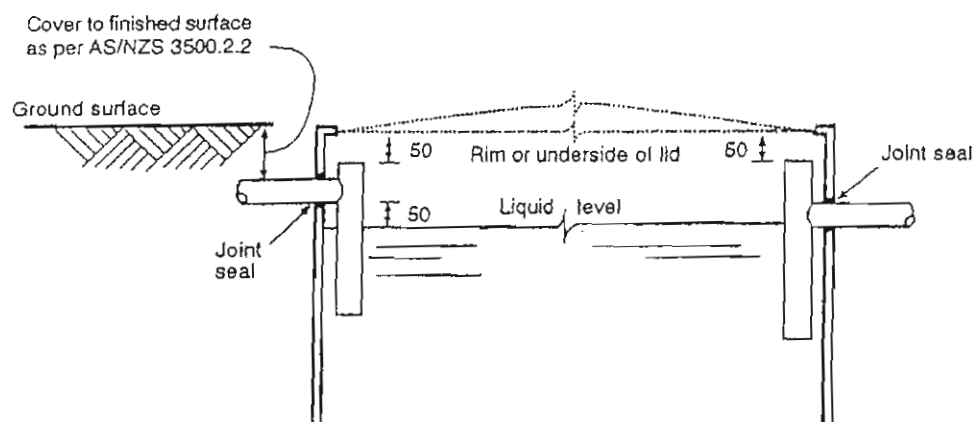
TYPICAL INSTALLATION ARRANGEMENT OF INLET AND OUTLET FITTINGS
